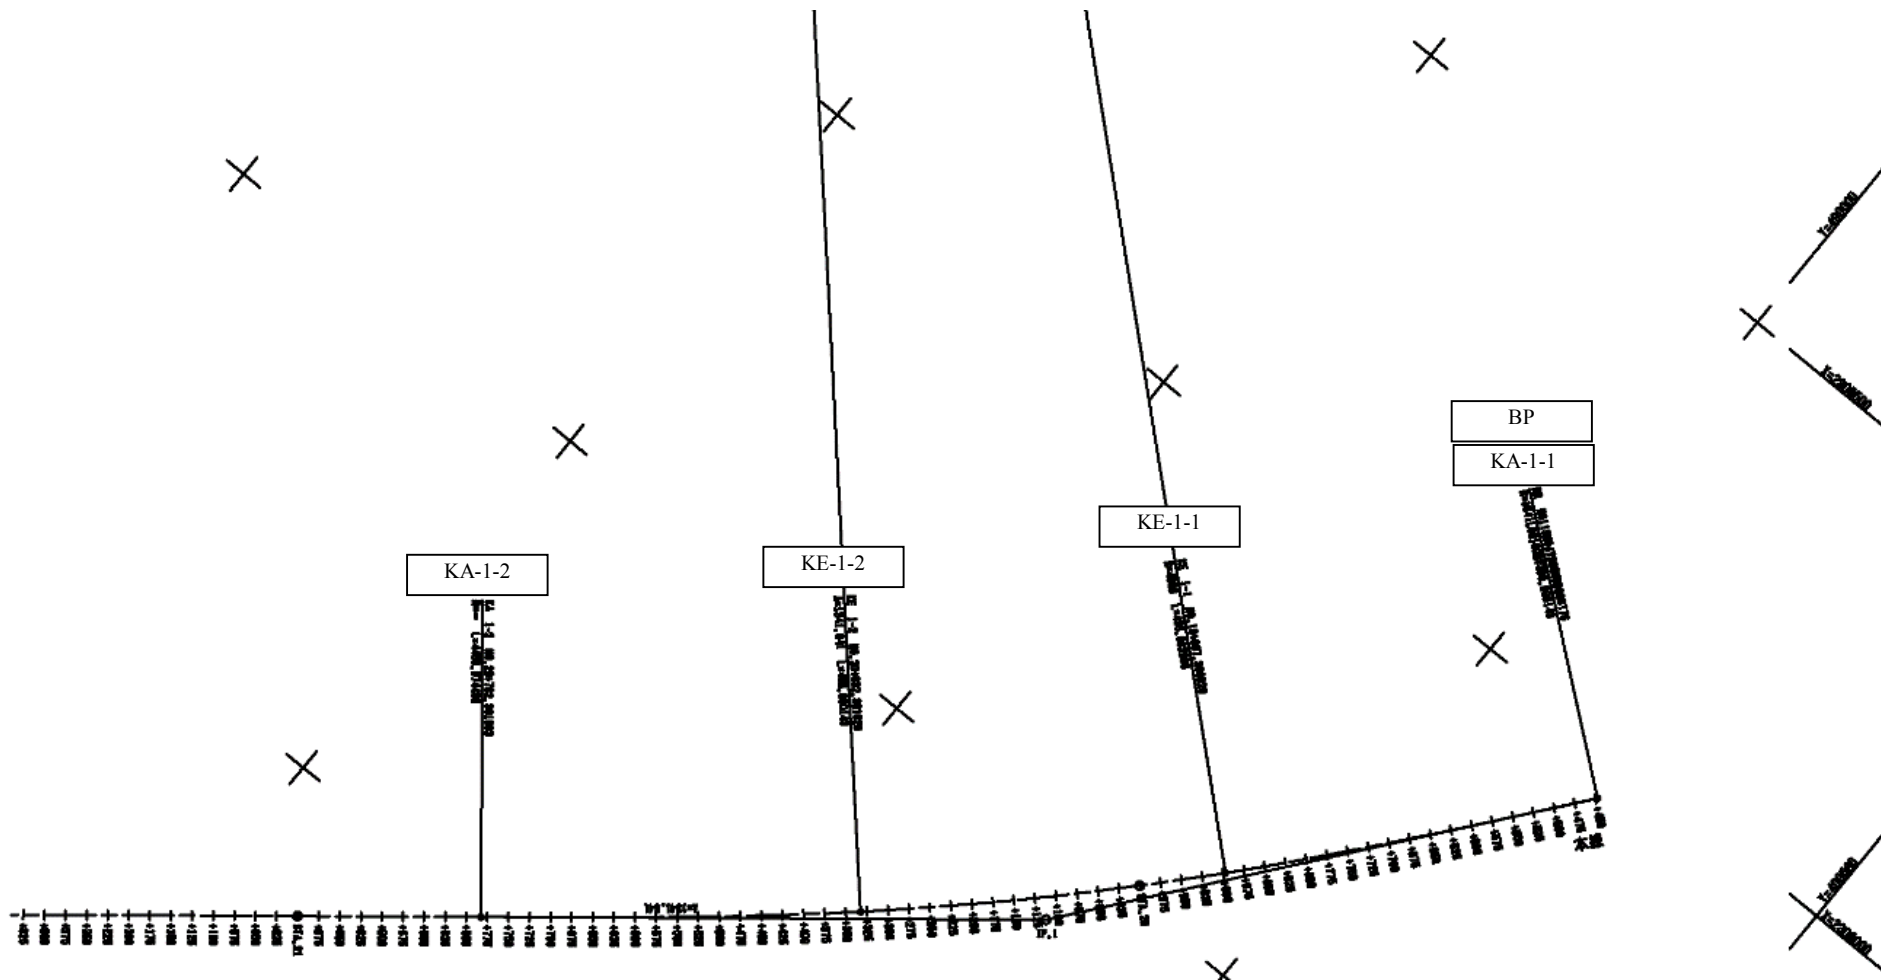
Road Horizontal Alignment Drawing (Halong side)
